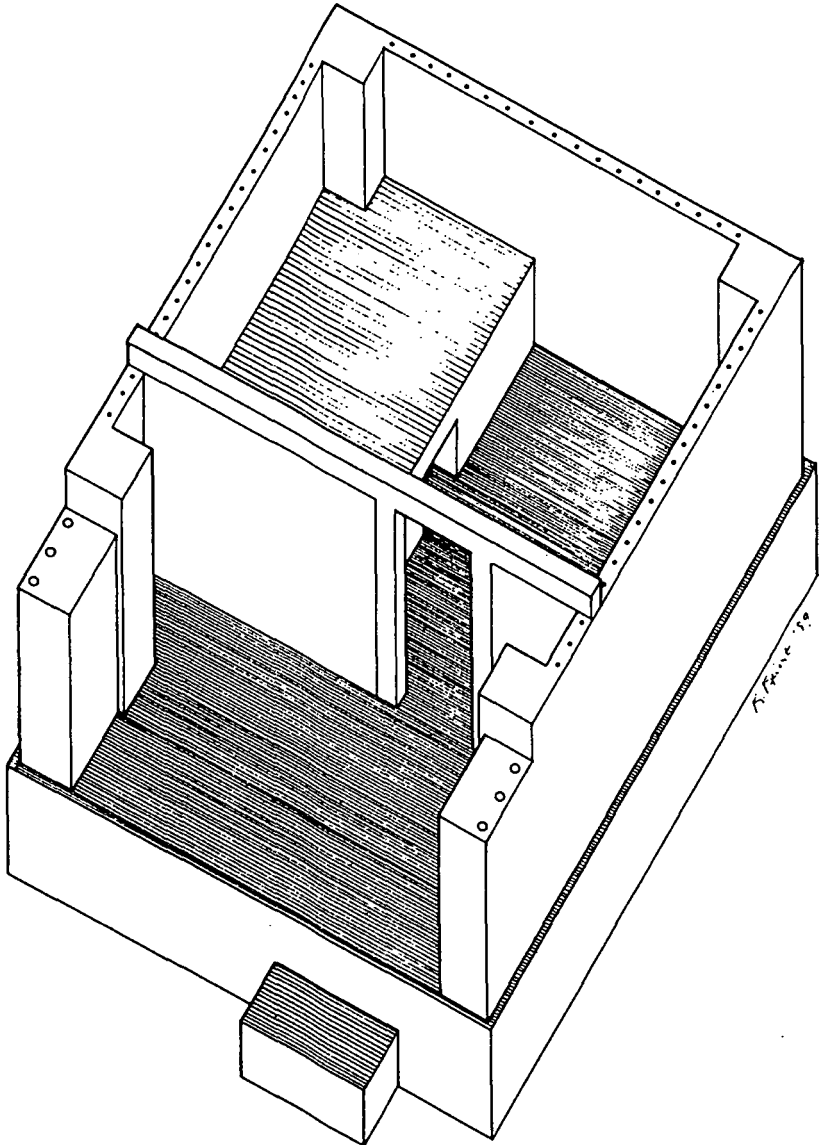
The Ceren site, El Salvador. Isometric drawing of Structure 2a, the communal structure of Household 2. The building was constructed on top of a solid earthen platform. Most walls are of wattle-and-daub, anchored by solid earthen columns. Note the offset front step and offset doorway. The adobe lintel probably was supported by a wooden lintel. Drawing by Karen Kievit.
